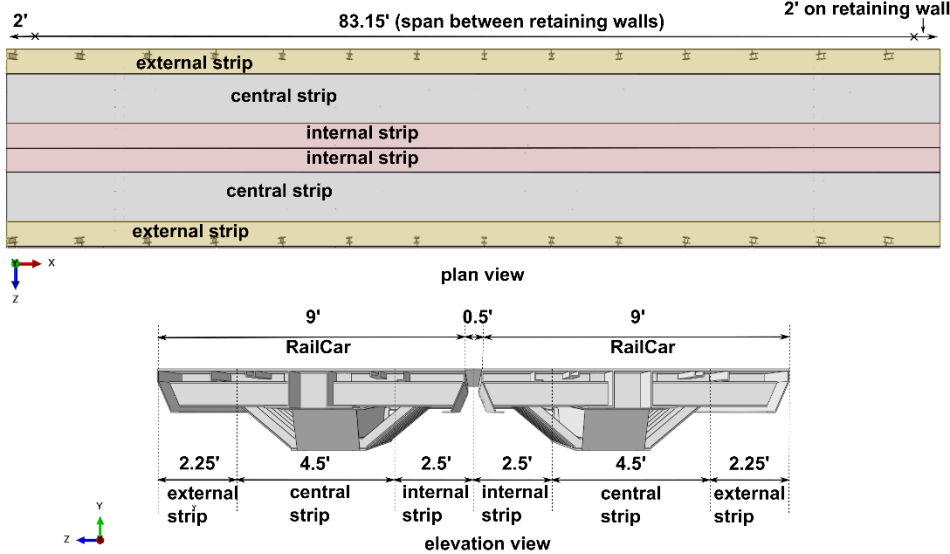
Plan and elevation view showing bridge divided into internal, central and external strips for analysis
